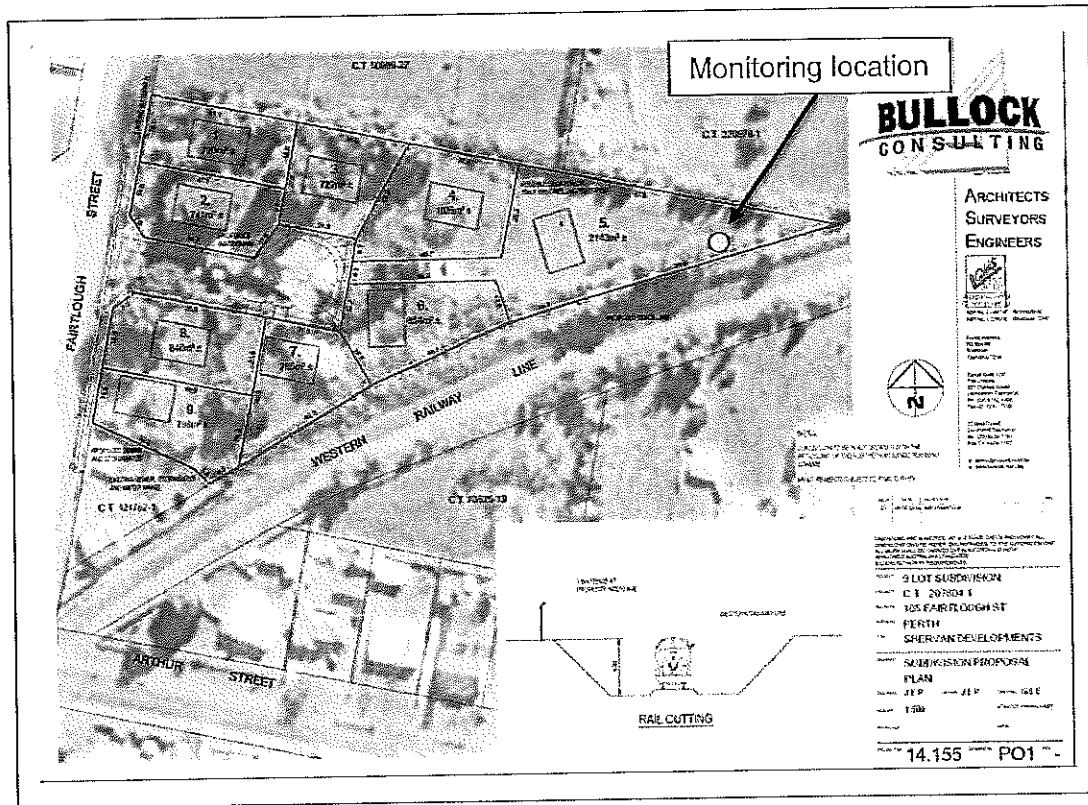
Aerial view of the proposed Fairtlough St subdivision (Provided by 6ty°).
